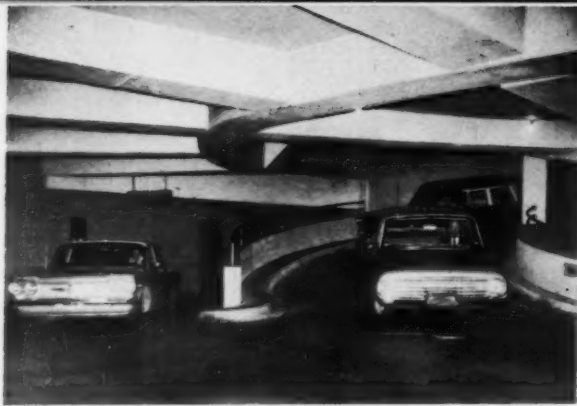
At this point in Fort Duquesne-Sixth Garage customers have a choice of exits to either of two streets. Massive framing is required to support the circular-ramp section of the building.
